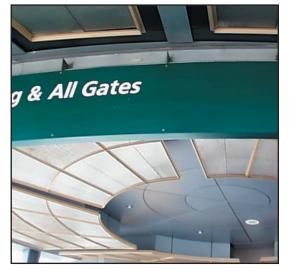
Metal Ceiling Application in Terminal 2W
